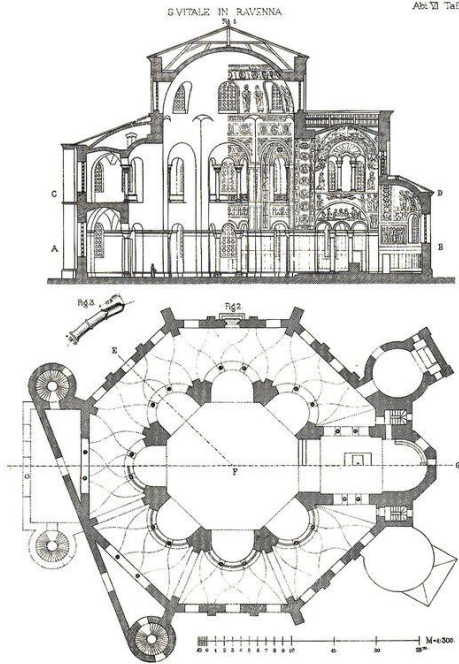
The church of San Vitale in Ravenna, the floor plan and section Figure 5: The church of San Vitale in Ravenna, the interior
